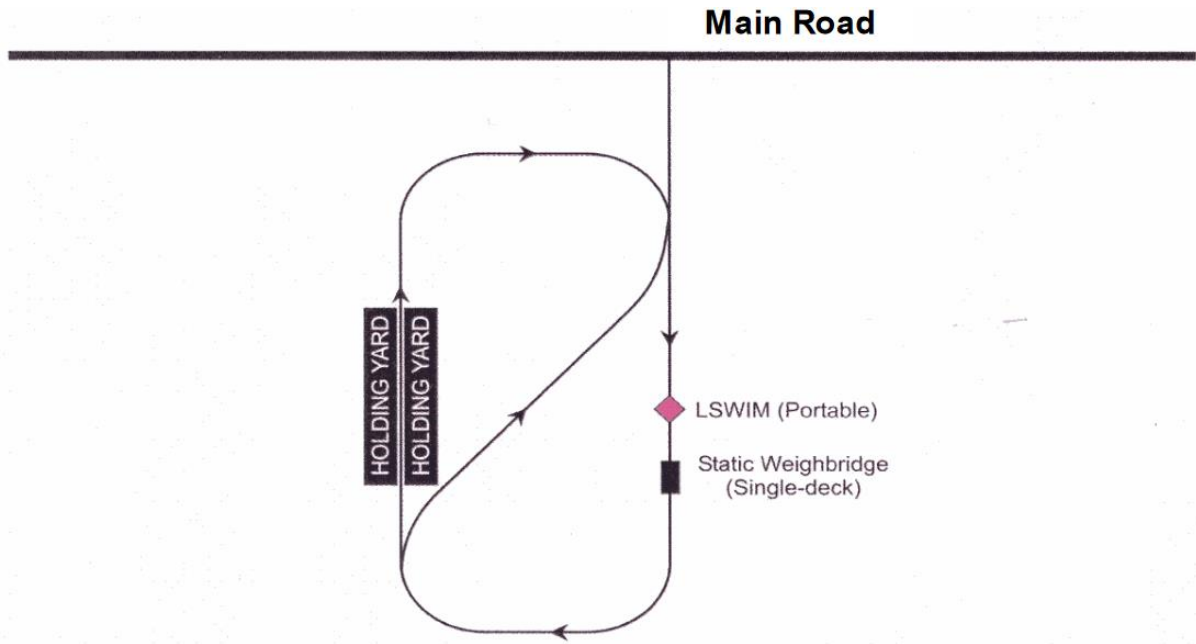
Typical Layout of a TCC 1 Facility
